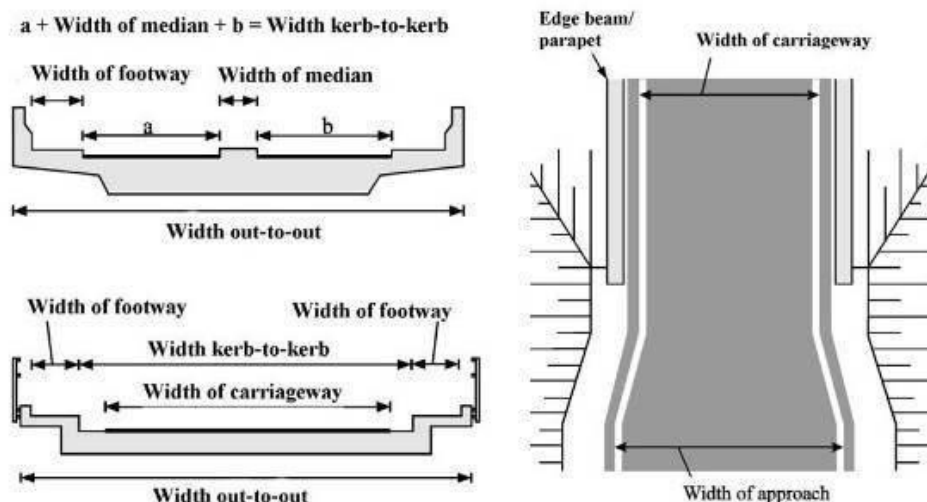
Typical Geometric details of Deck Surface for Bridge
